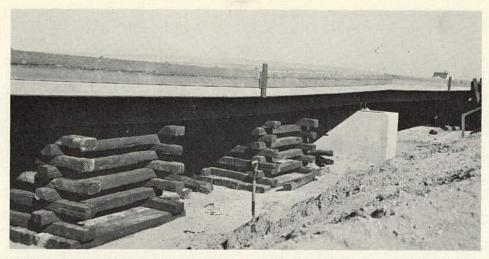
Maintenance forces placed railroad tie cribbing under test bridges.
